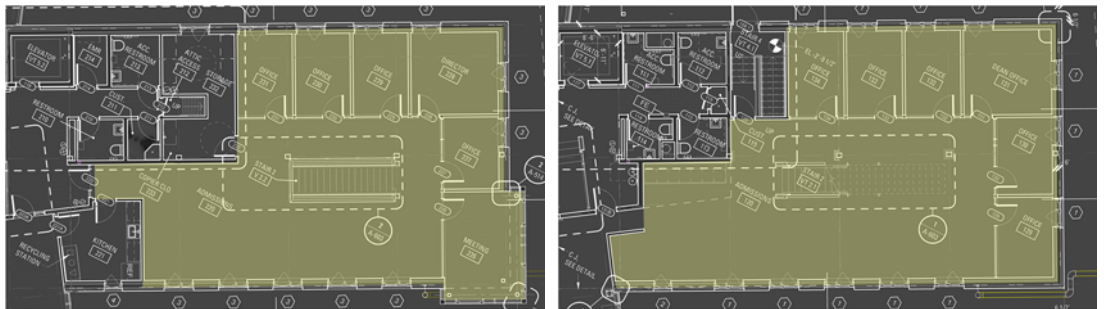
Ground Floor (Left) + Second Floor (Right) Admissions Floor Plan
